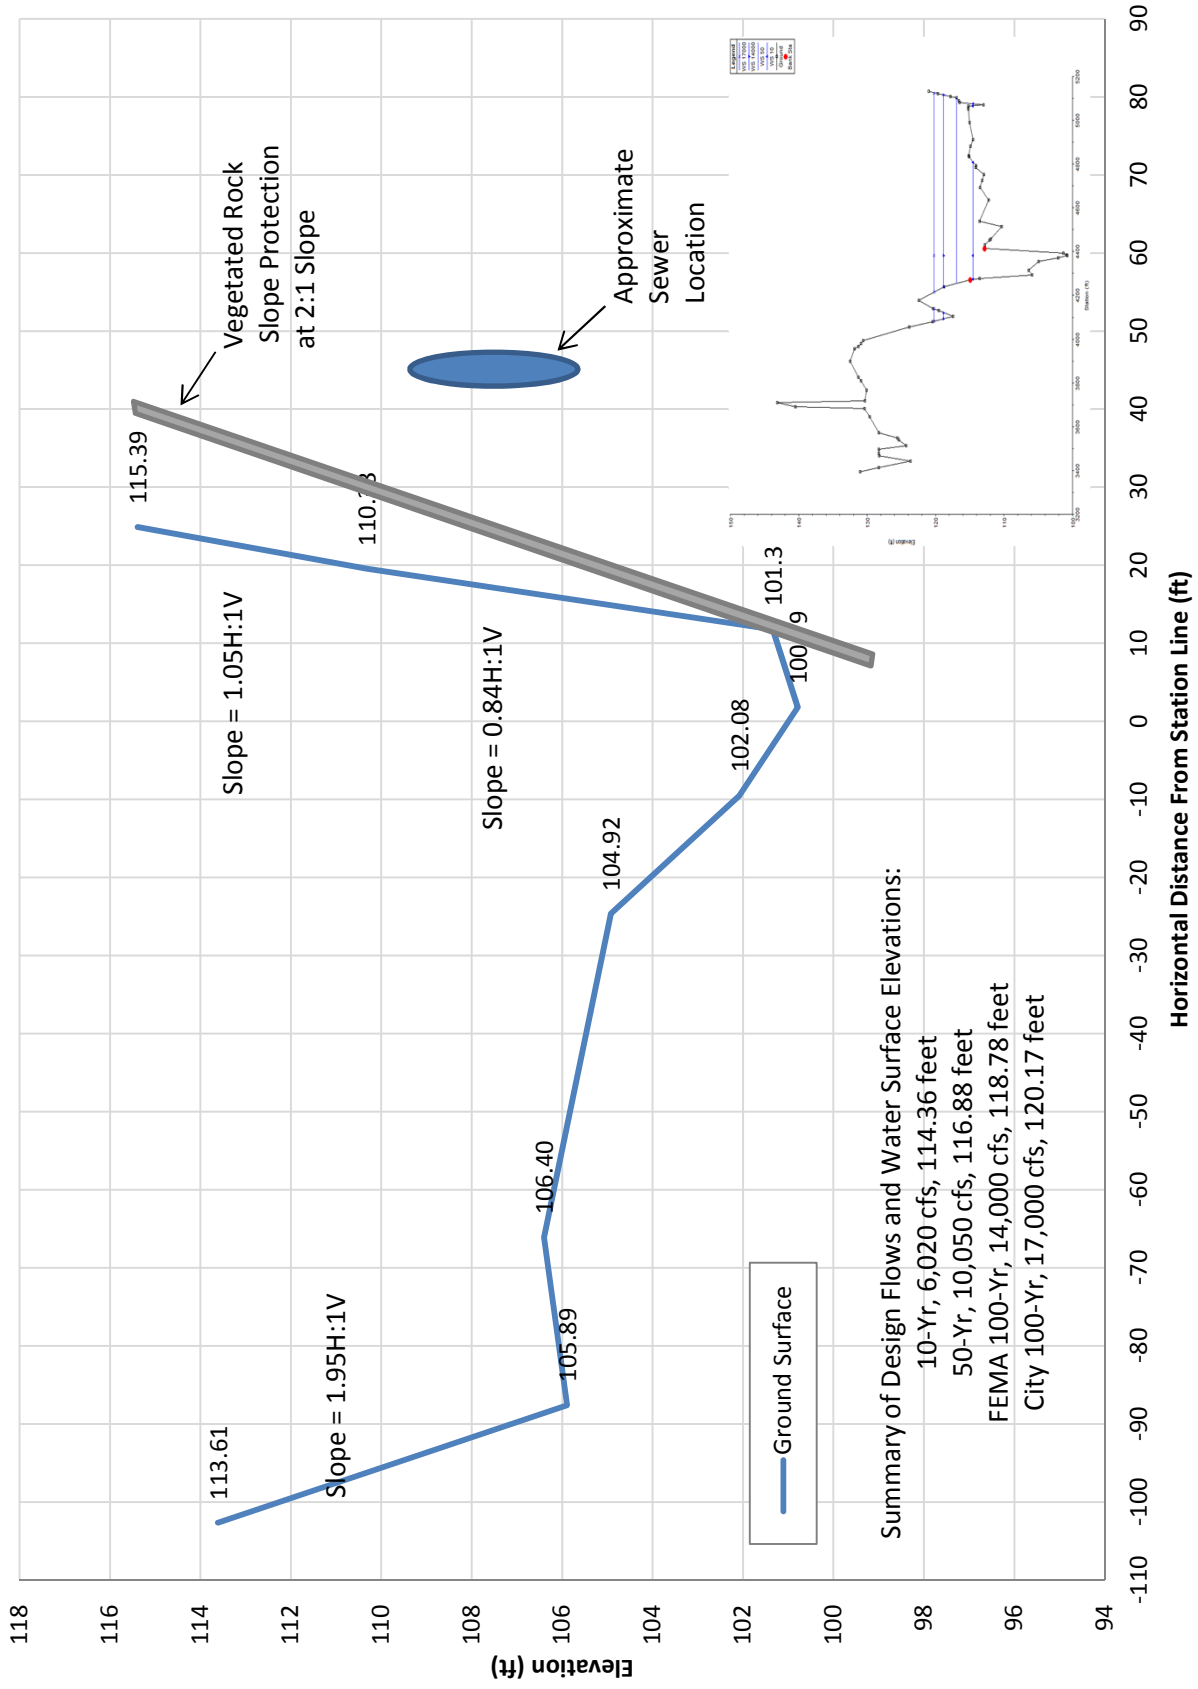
Cross Section 8 (at HEC RAS Station 66874.3)
